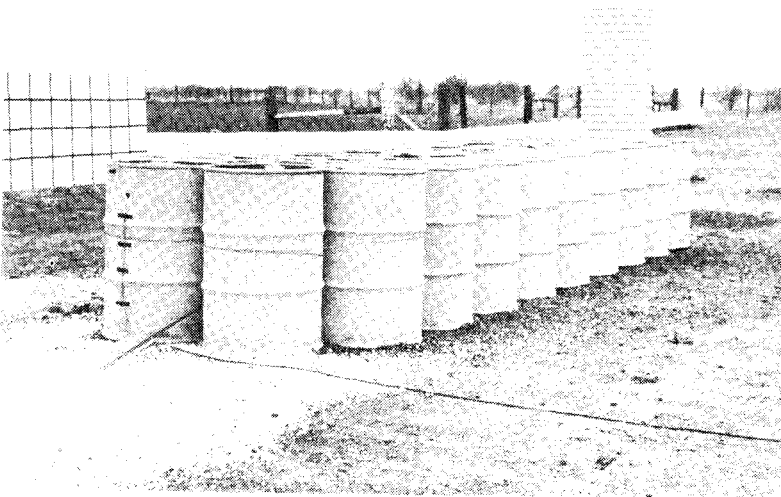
Barrel Protective Barrier Installed in Front of 20 in. Diam. simulated Bridge Pier
